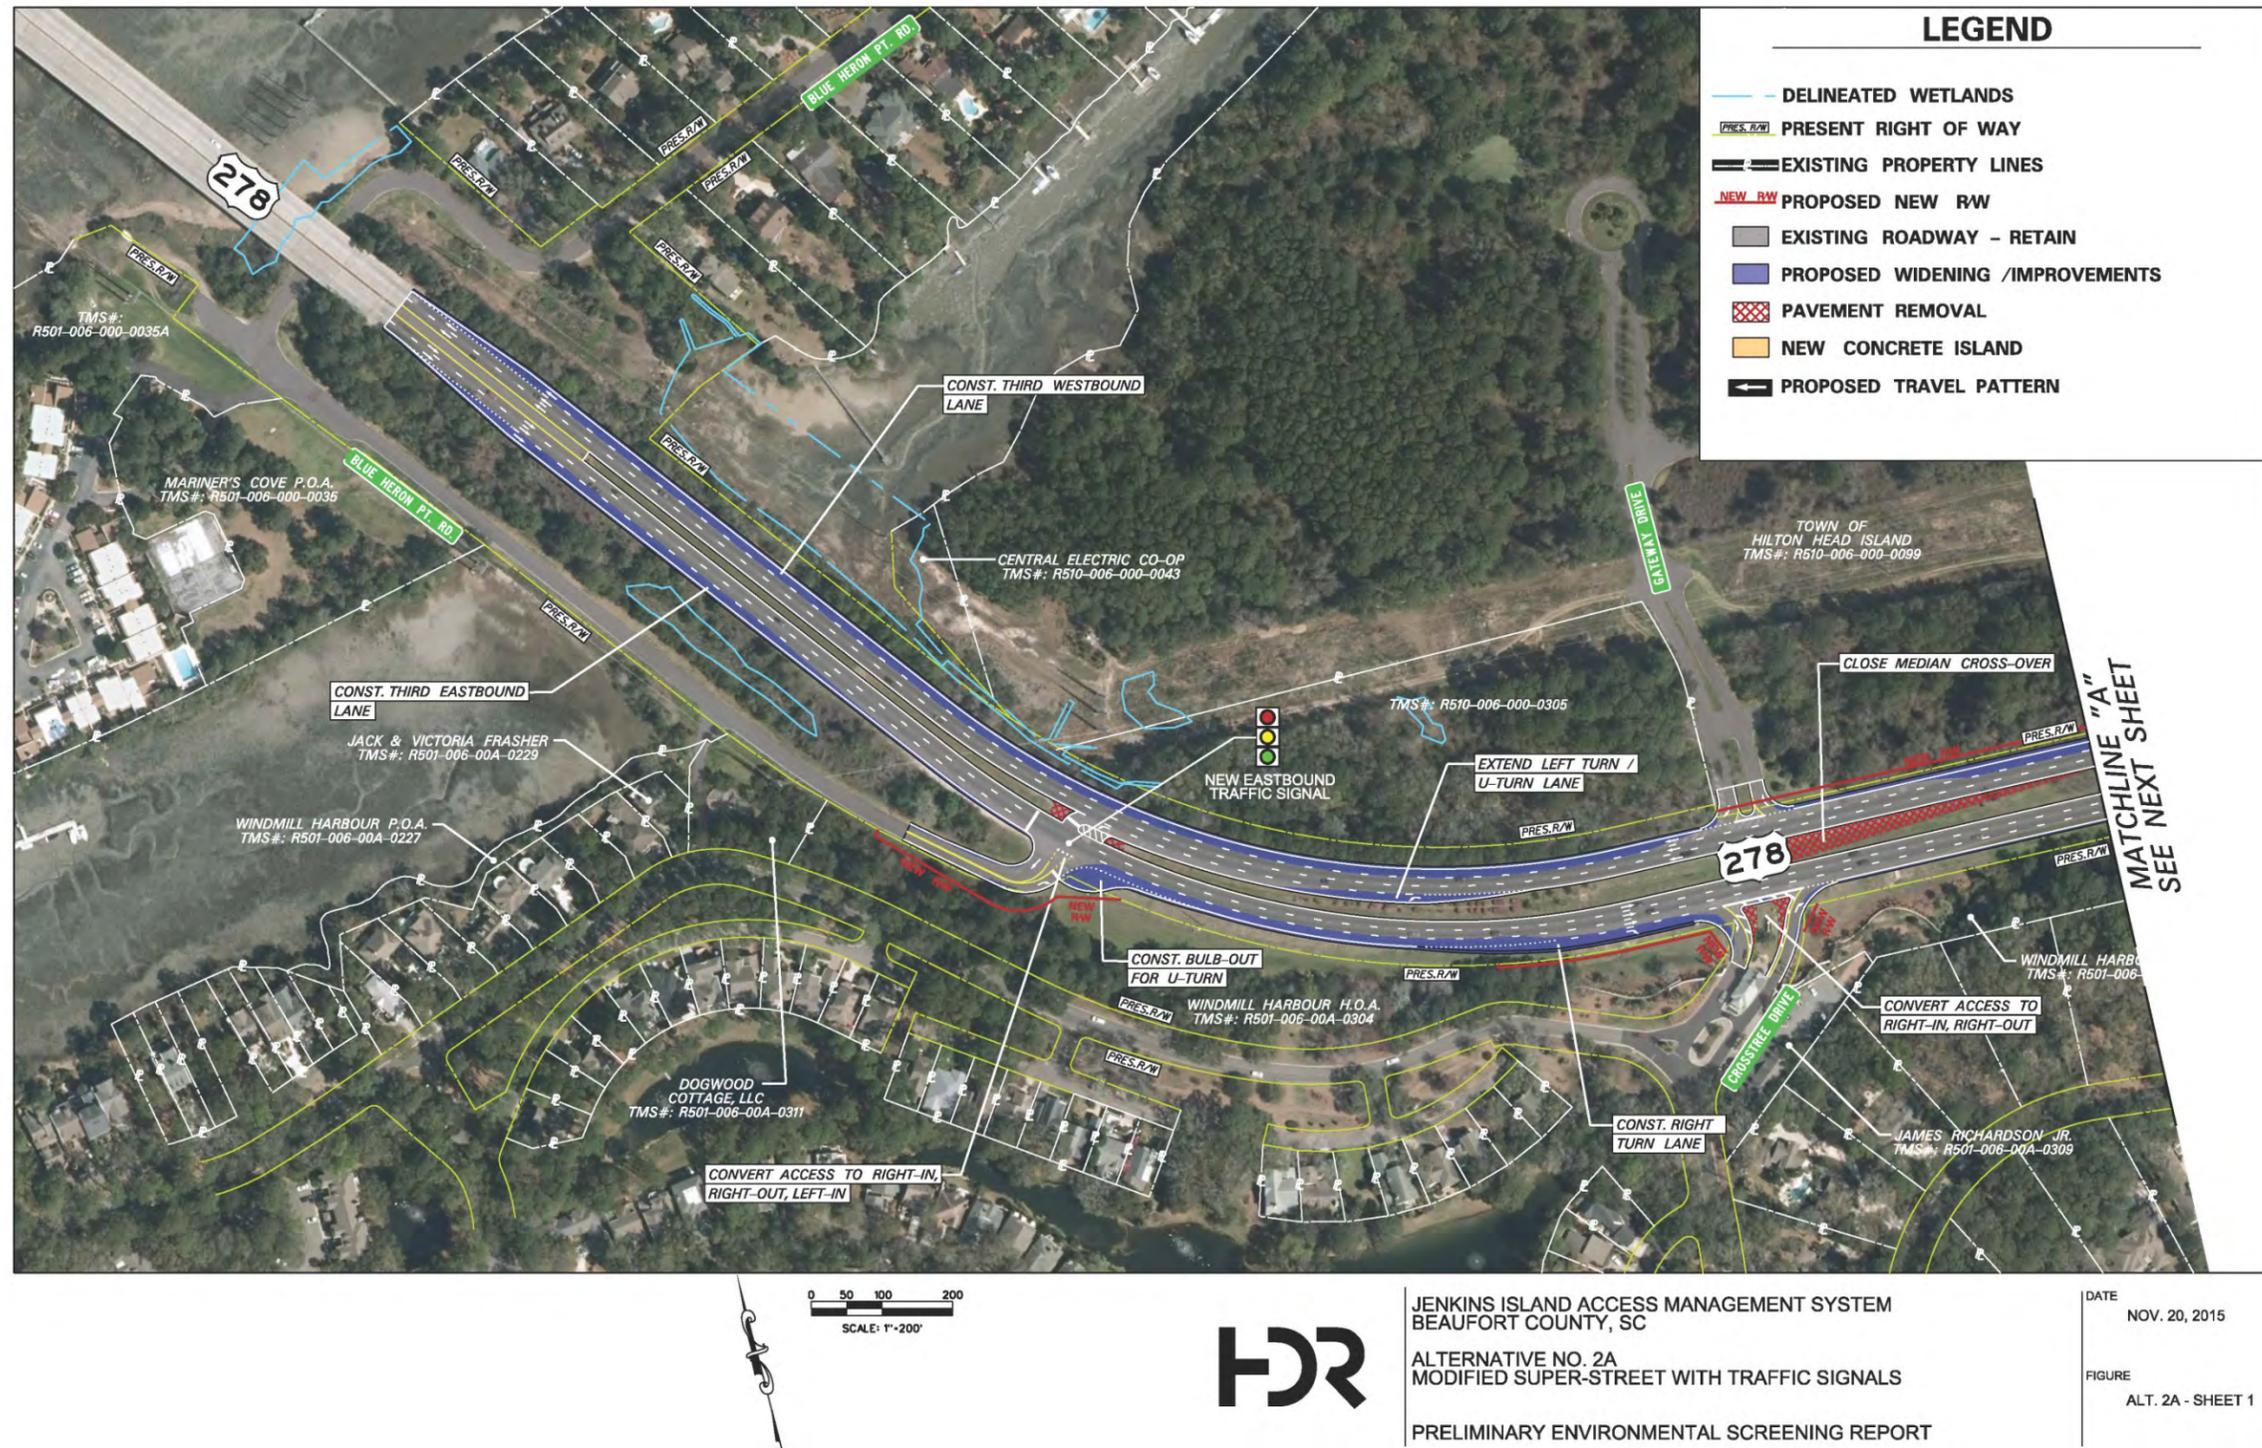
Alternative 2A (Sheet 1 and 2)
